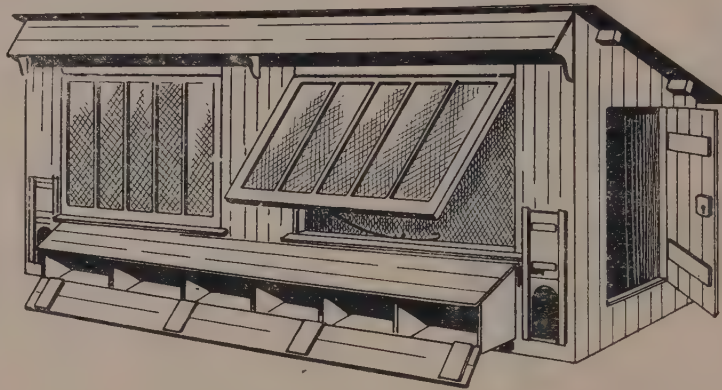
POULTRY HOUSE : LENGTH, 10 FEET; WIDTH, 5 FEET.
